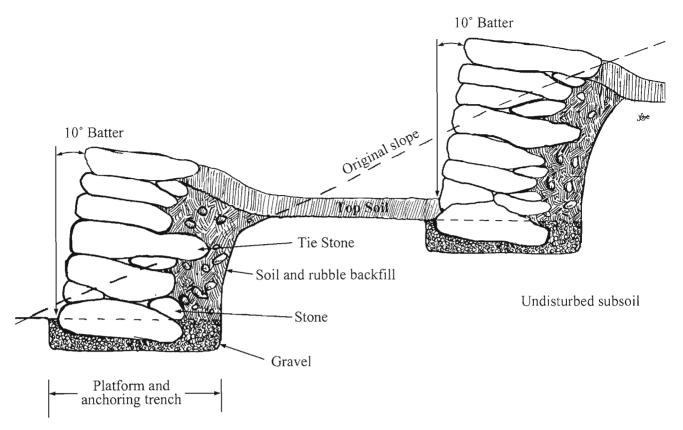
Elevation view of two dry-laid stone retaining walls and associated terraces. The "tie" stones or "deadmen" are long stones randomly placed in the wall to reach further back into the backfill to better tie or anchor the wall in place.
